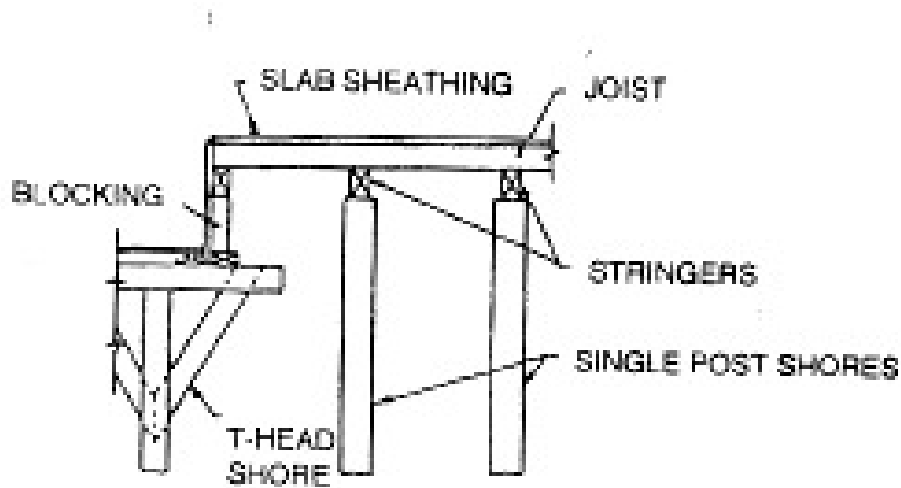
Typical Slab form Resting on beam Ledger and Stringers
